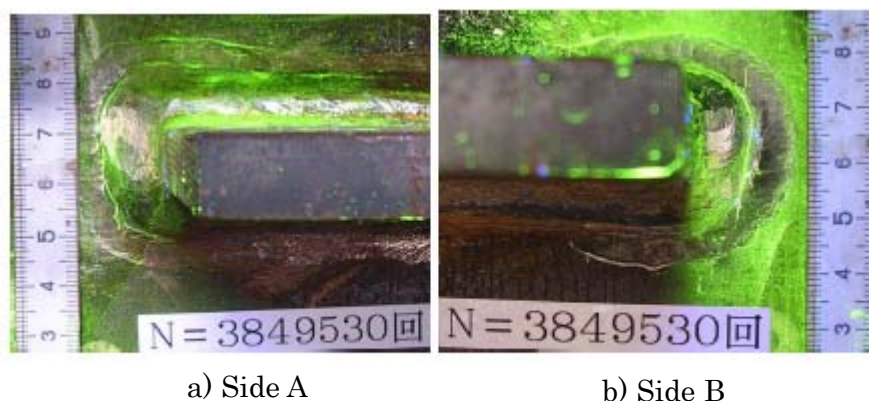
Appearance of fatigue crack at area S5 on No.2 specimen
